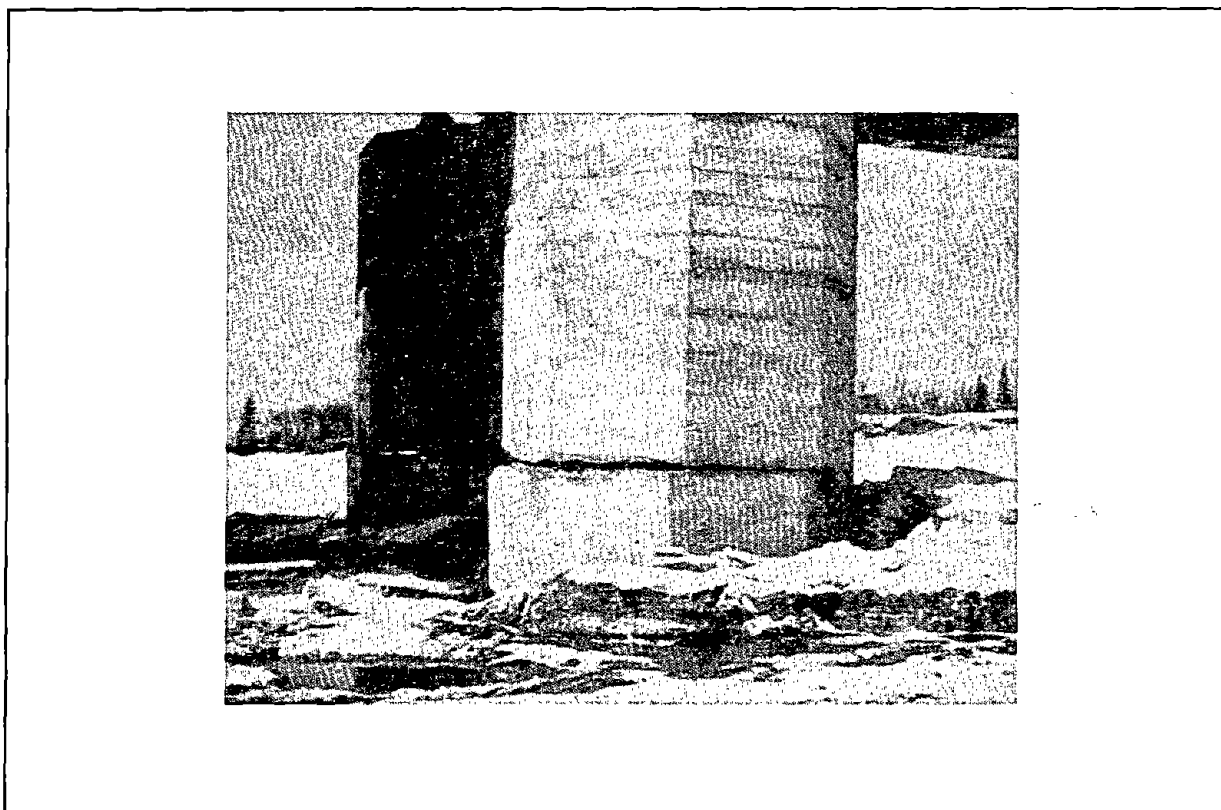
Broken and Displaced Piers at Bridge Milepost 147.1.
